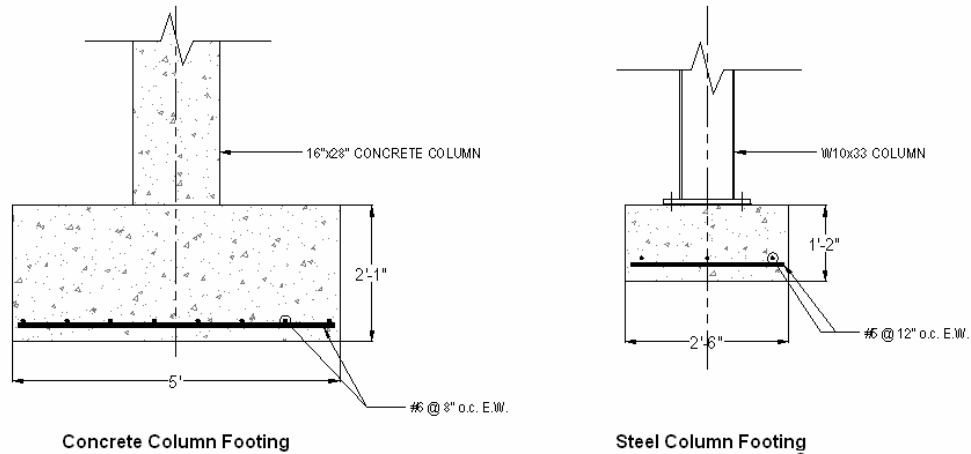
Comparison of gravity column footings for existing concrete structure and proposed steel structure
